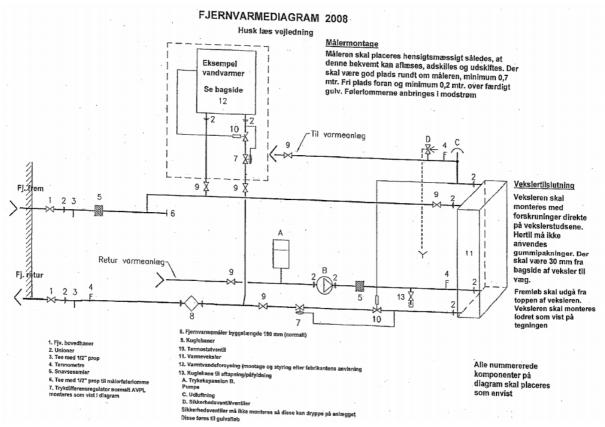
Substation connection used in Skagen (Skagen Varmevaerk, 2009)
